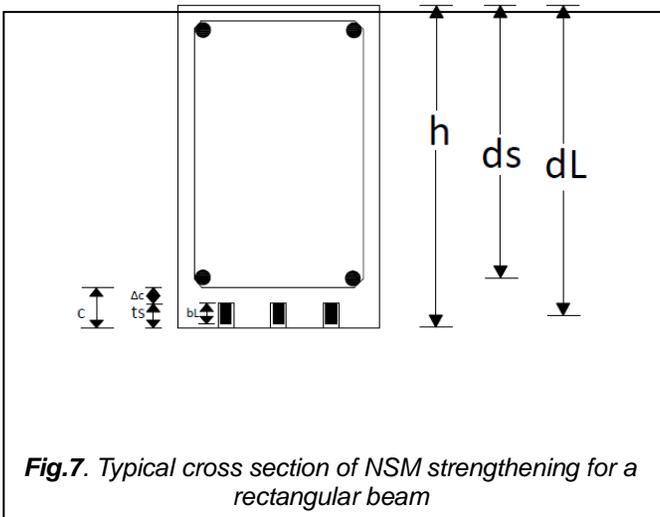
Typical cross section of NSM strengthening for a rectangular beam
